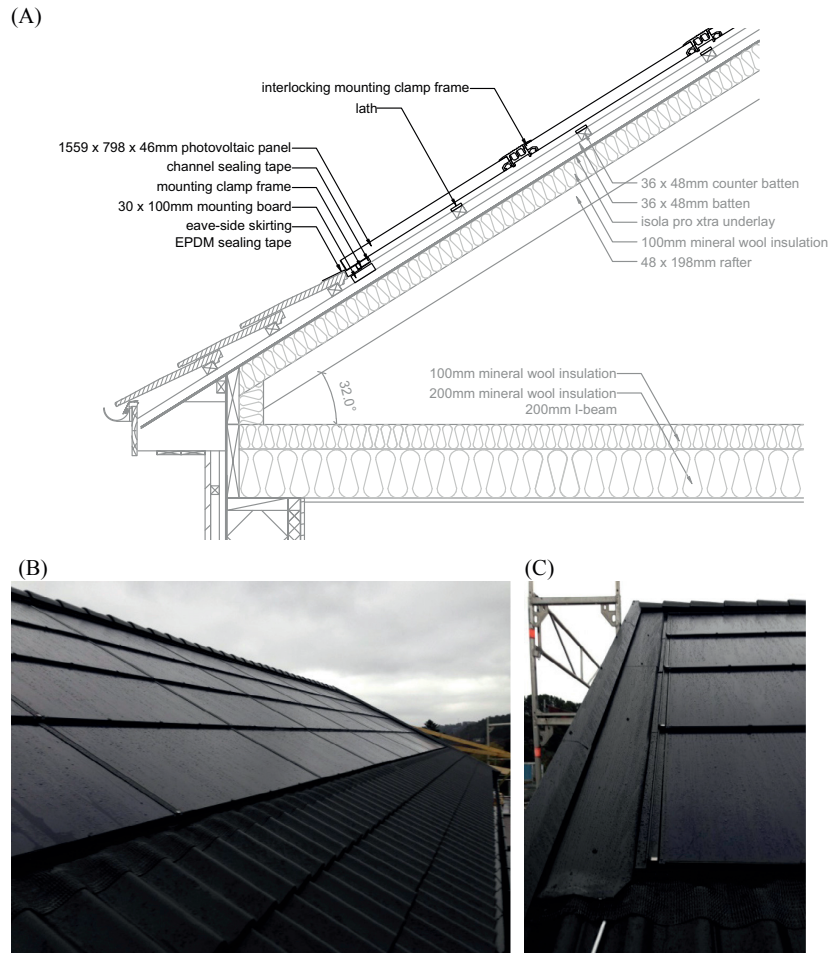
(A) Section of the roof construction adapted from Roald Rasmussen at Skanska, (B) picture of the roof installation, and (C) end profil.
